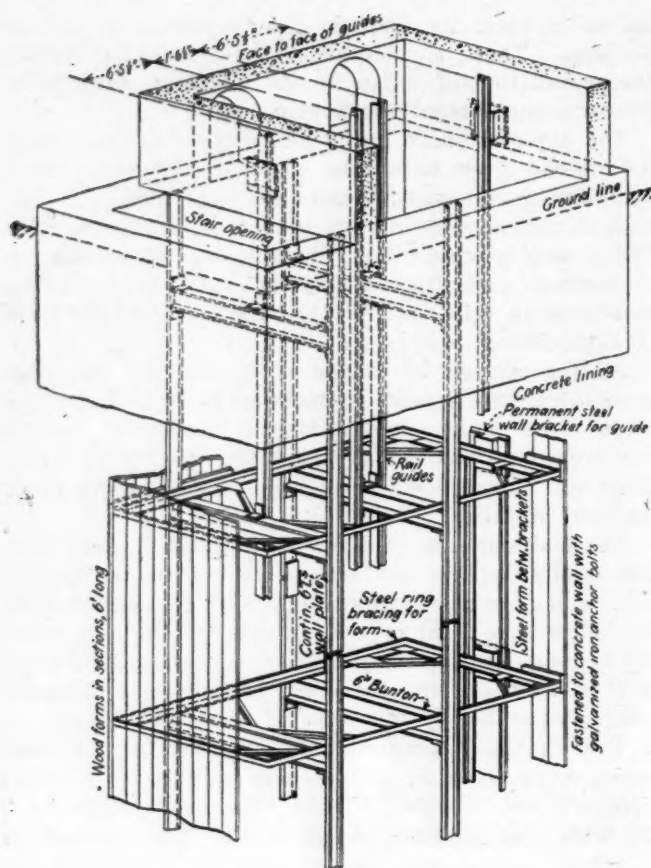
ISOMETRIC PROJECTION SHOWING DETAILS OF MAINSHAFT CONSTRUCTION
